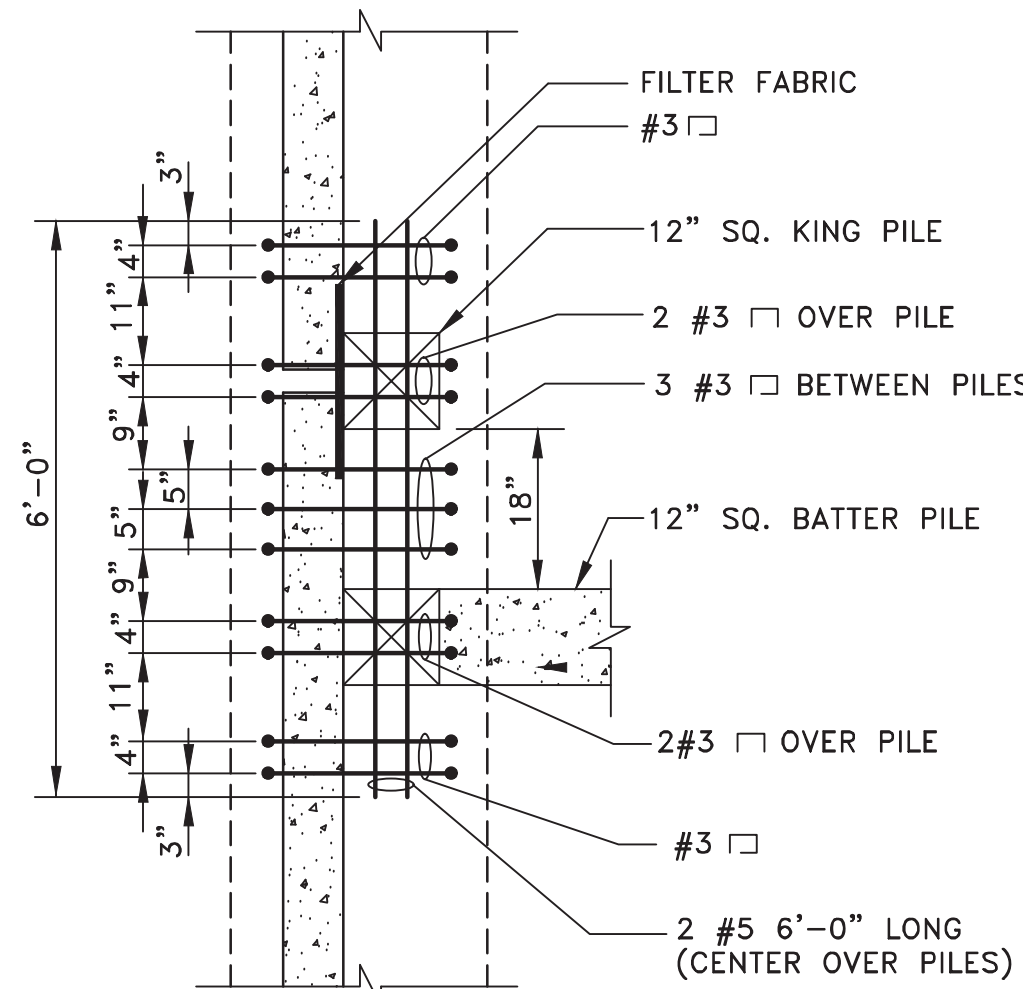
DETAIL: NON-TYPICAL PRECAST CONCRETE PANEL
